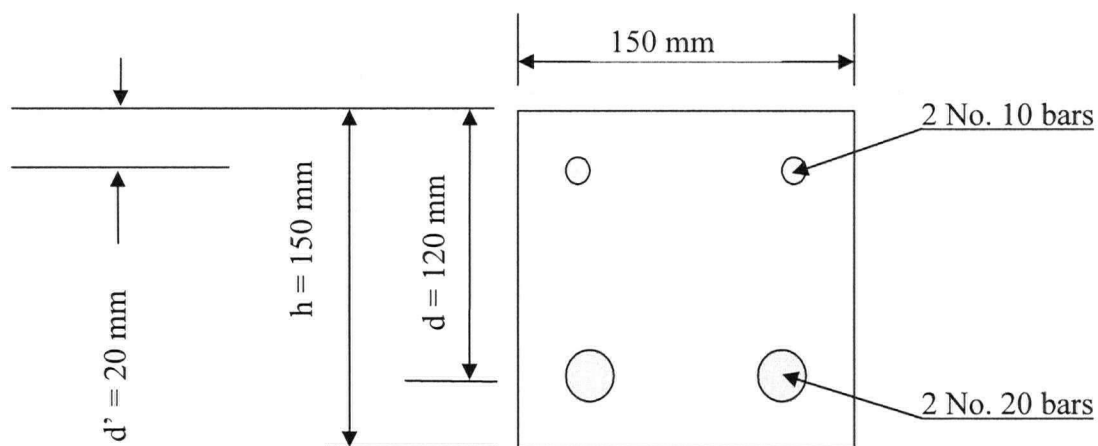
Cross-Sectional Details of Beams B2F-NS, BUF-NS and BU2F-NS before Strengthening
